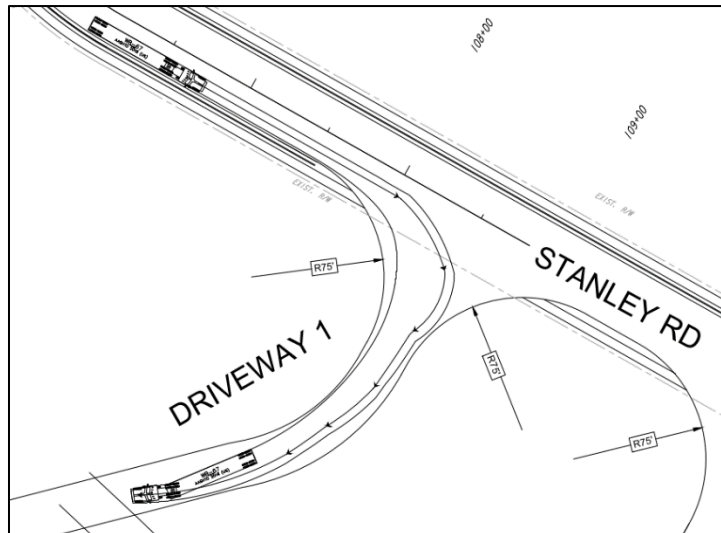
Stanley Road at Driveway 1 – Eastbound Right (Entering Truck)
